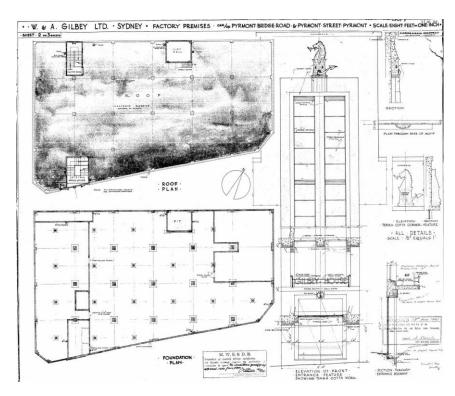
1947 – Roof and foundation plans for the proposed factory premises for W & A Gilbey Ltd by C. Orme, architect, Melbourne, approved 10 July 1947 and amended in 1948 (Source: City of Sydney Archives, Pyrmont Bridge Rd NW cnr & Pyrmont St (adjacent No 135), new building (01/01/1947 - 31/12/1947), [A-00572010]. https://archives.cityofsydney.nsw.gov.au/nodes/view/1437047)
